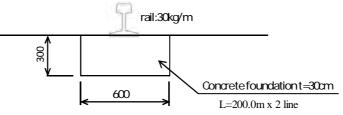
Gantry crane 7.5t Rail foundation
